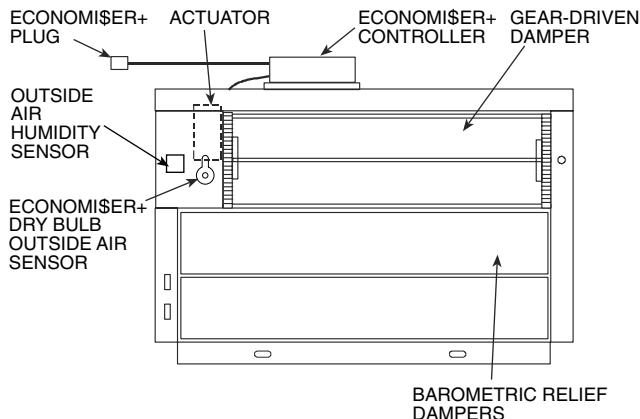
EconoMiSer+ Component Locations — 3 to 6 Ton Units
